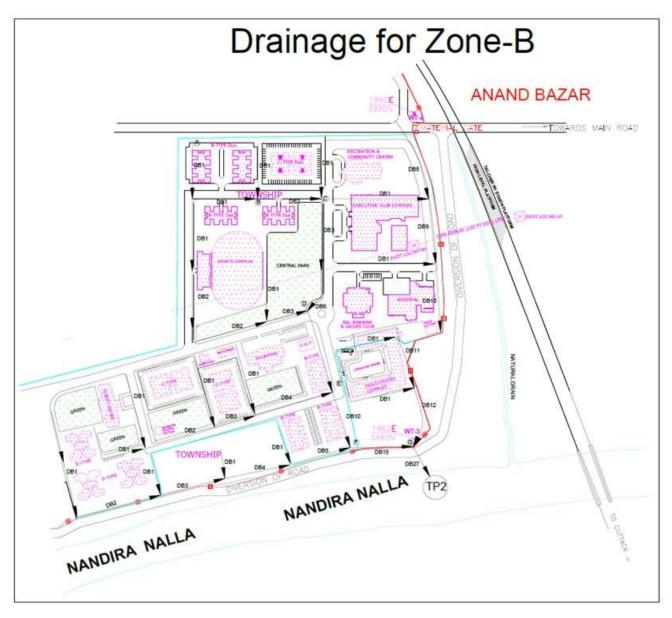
B Zone drainage plan showing drains, longest flow path and outfall location
